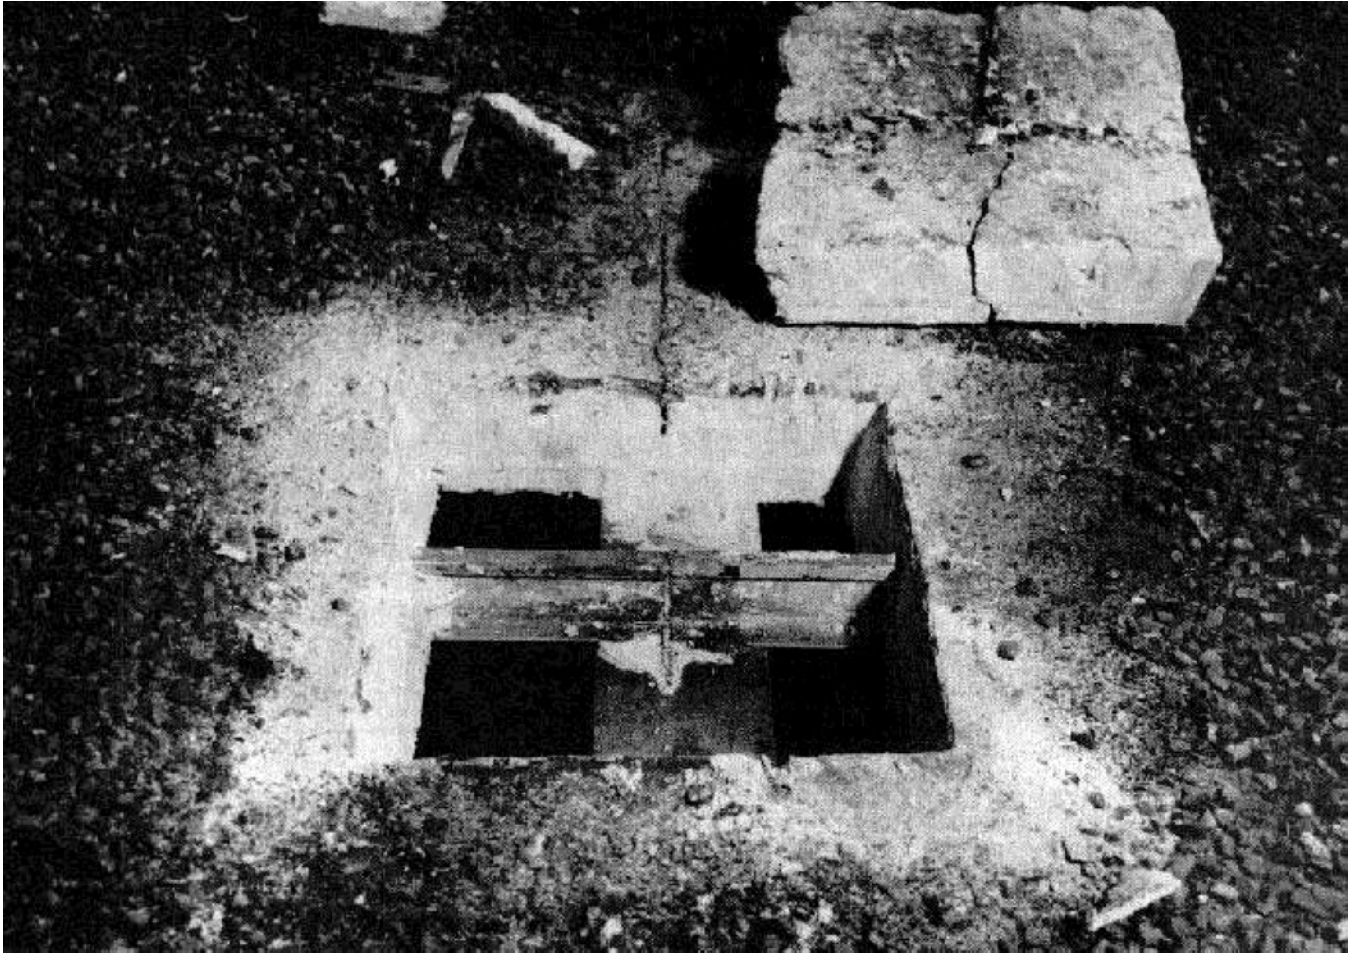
Test cut in gypsum deck — crack extends up through roofing membrane mopped directly to deck.
